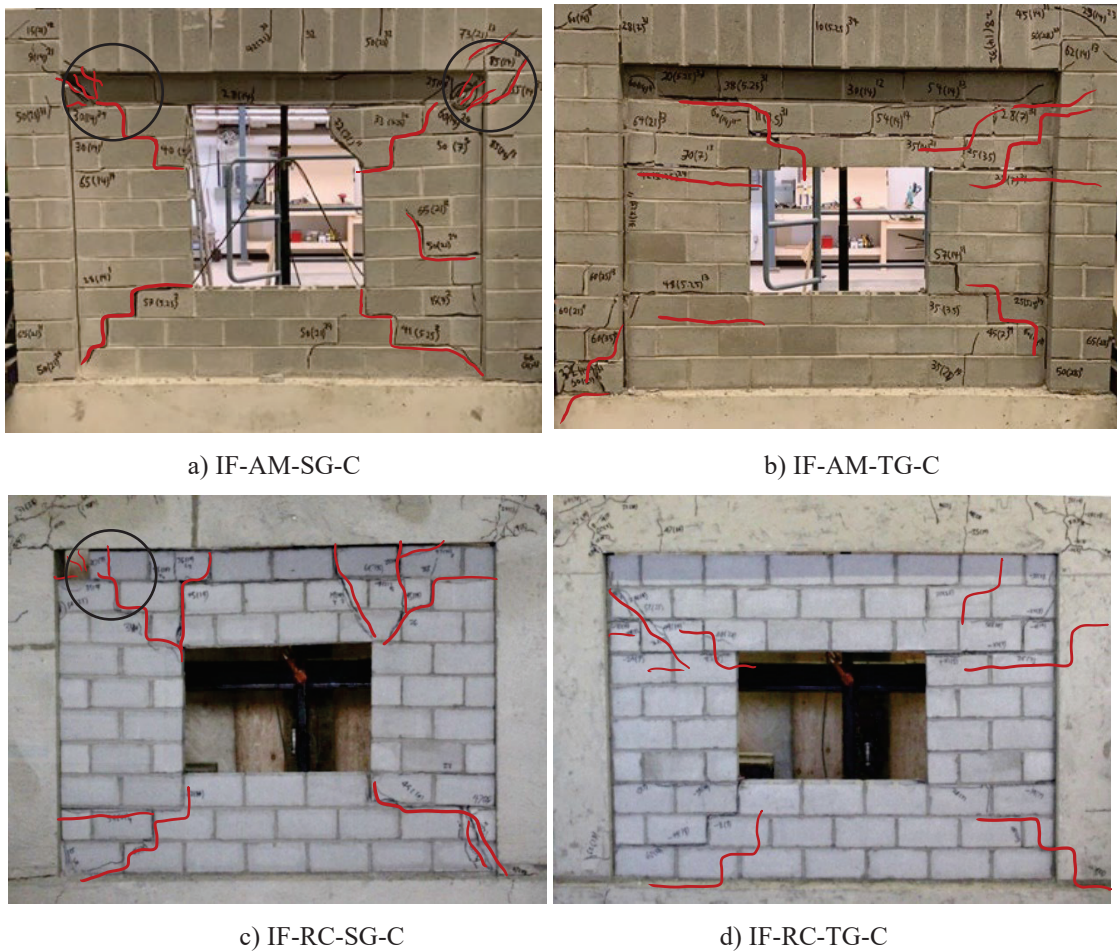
Failure pattern of Group 6 specimens under cyclic loading
